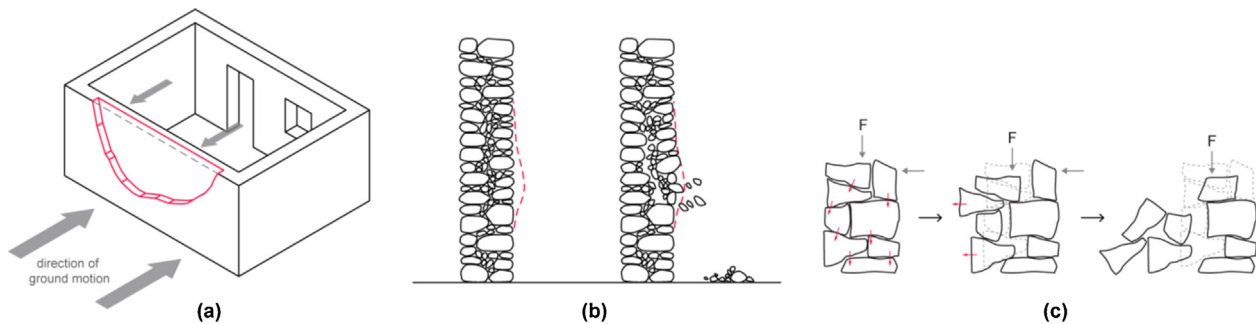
(a) Delamination of the wall leaf; (b) inner leaf causing the bulging of the exterior wall leaf (adapted from [75]); and (c) wall failure caused by the irregularity of stones (adapted from [76]).
